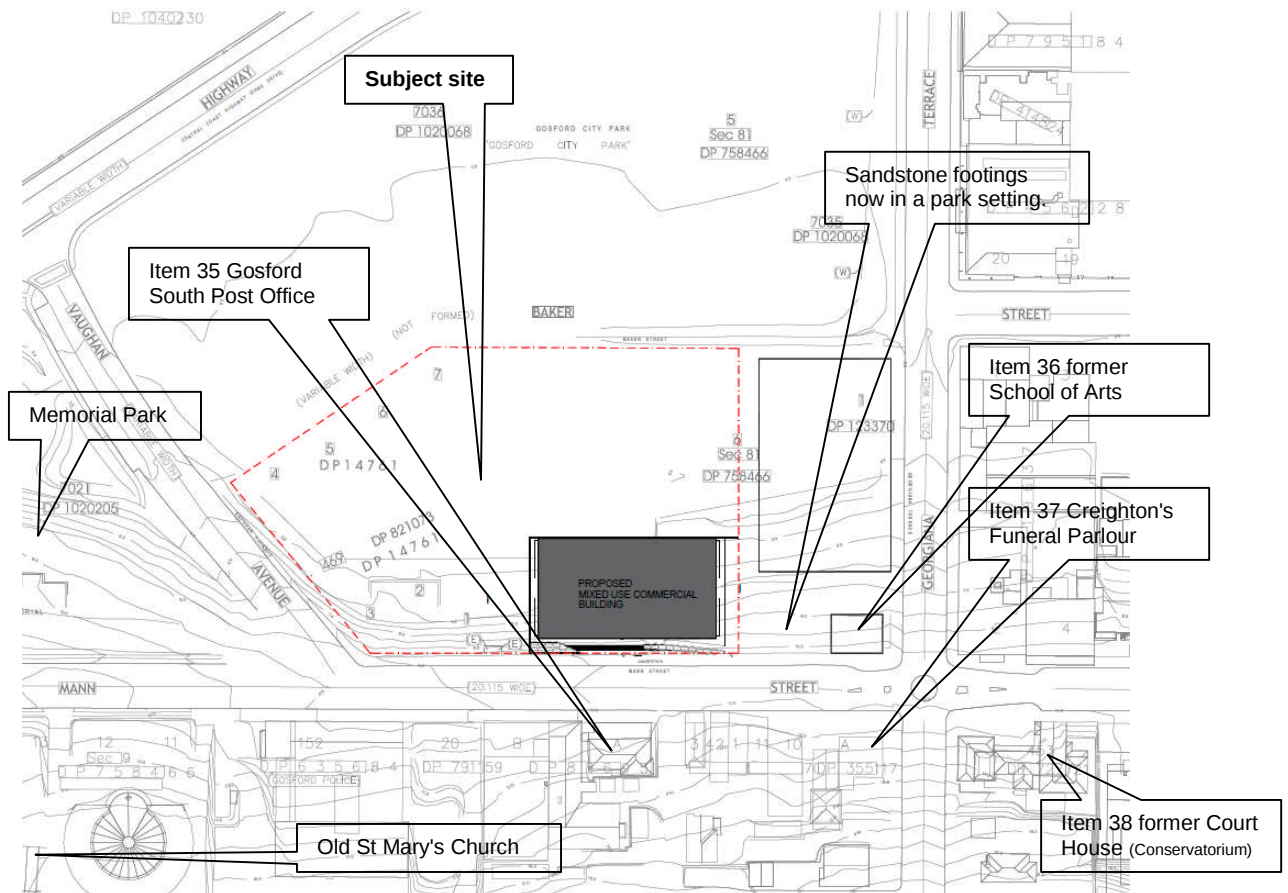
A site plan showing the proposed new commercial development in relation to the Post Office, the School of Arts building, footings and other nearby heritage items. (Source - Group GSA Pty Ltd)
